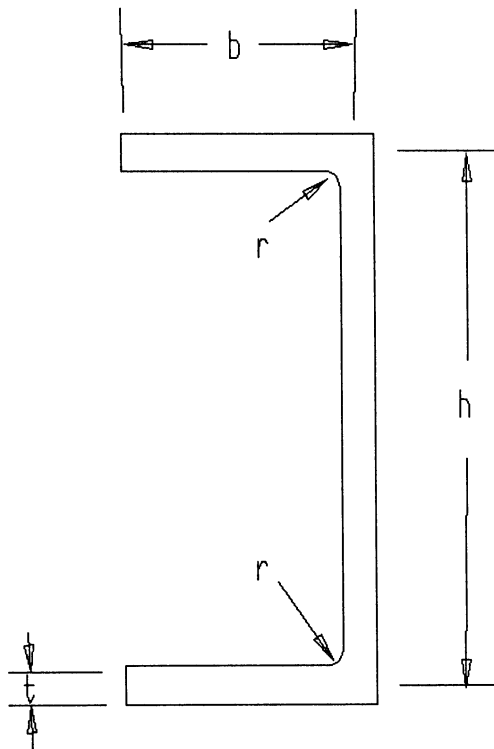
Reentrant Corners and Cross Sectional Dimension of Open Channel Section
